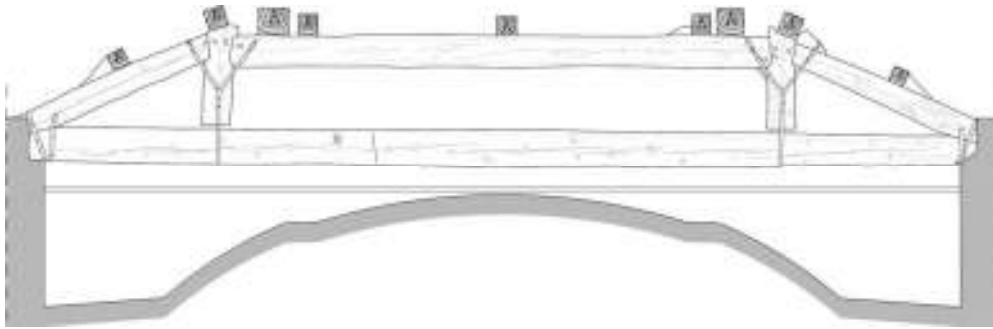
Northern façade of truss 1 (drawing by S. Albertario, F. Lipari, M. Pasini, X. Qushku).
